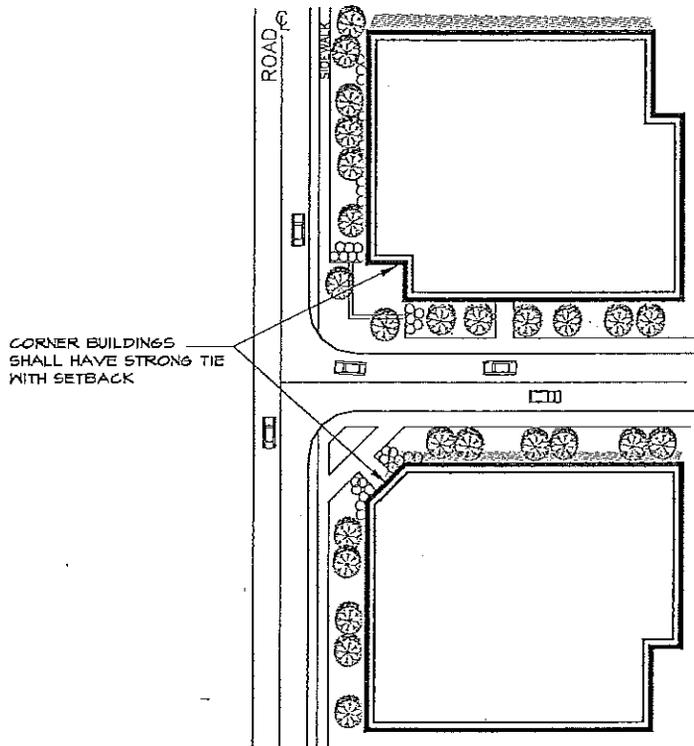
TYPICAL CORNER LAYOUT
